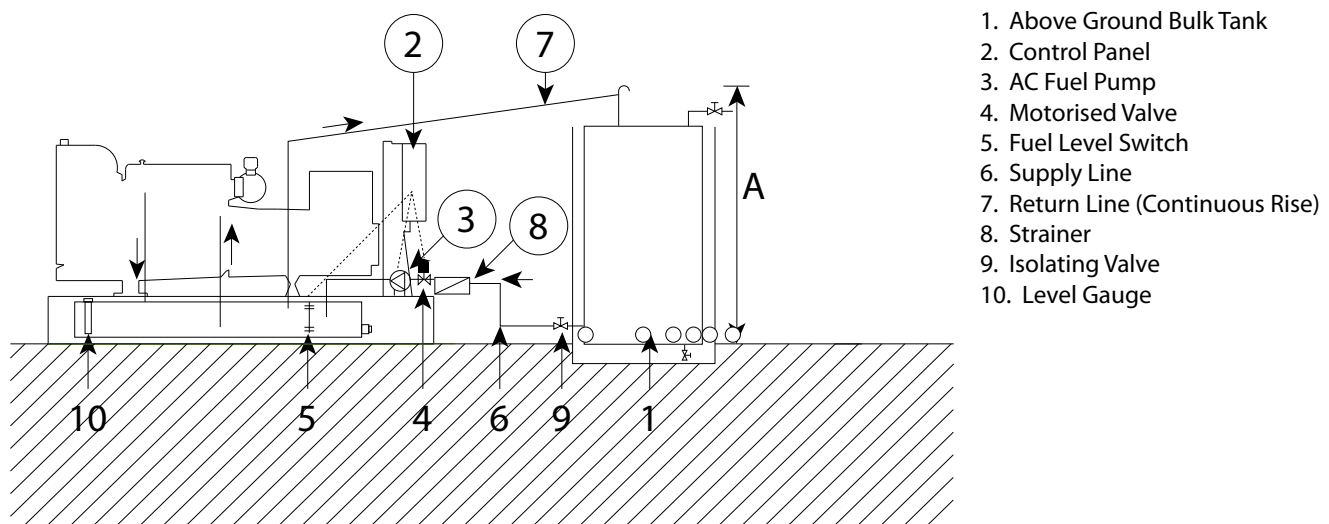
Typical Layout with Fuel System 4 (FK4)
